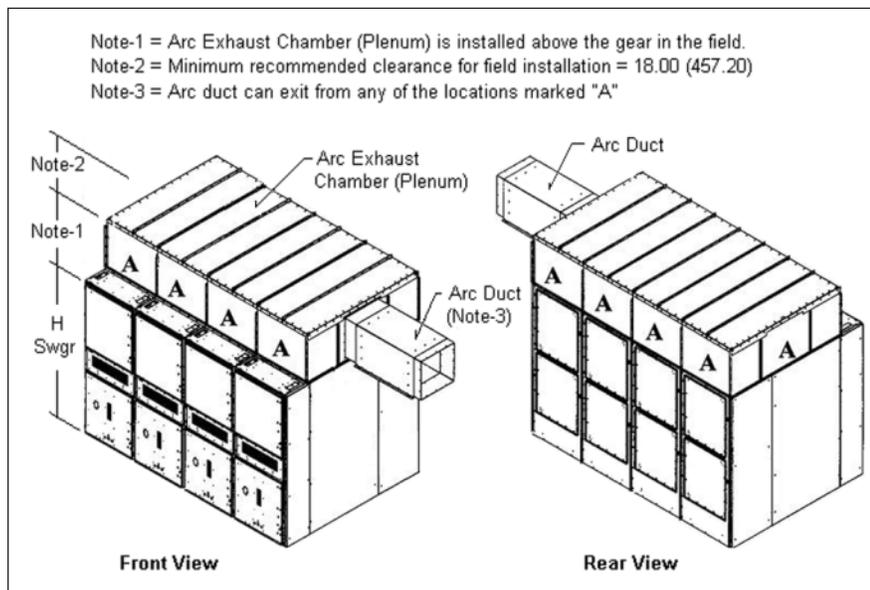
Arc Exhaust Chamber (Plenum) with Arc Duct Exit Above the Switchgear
